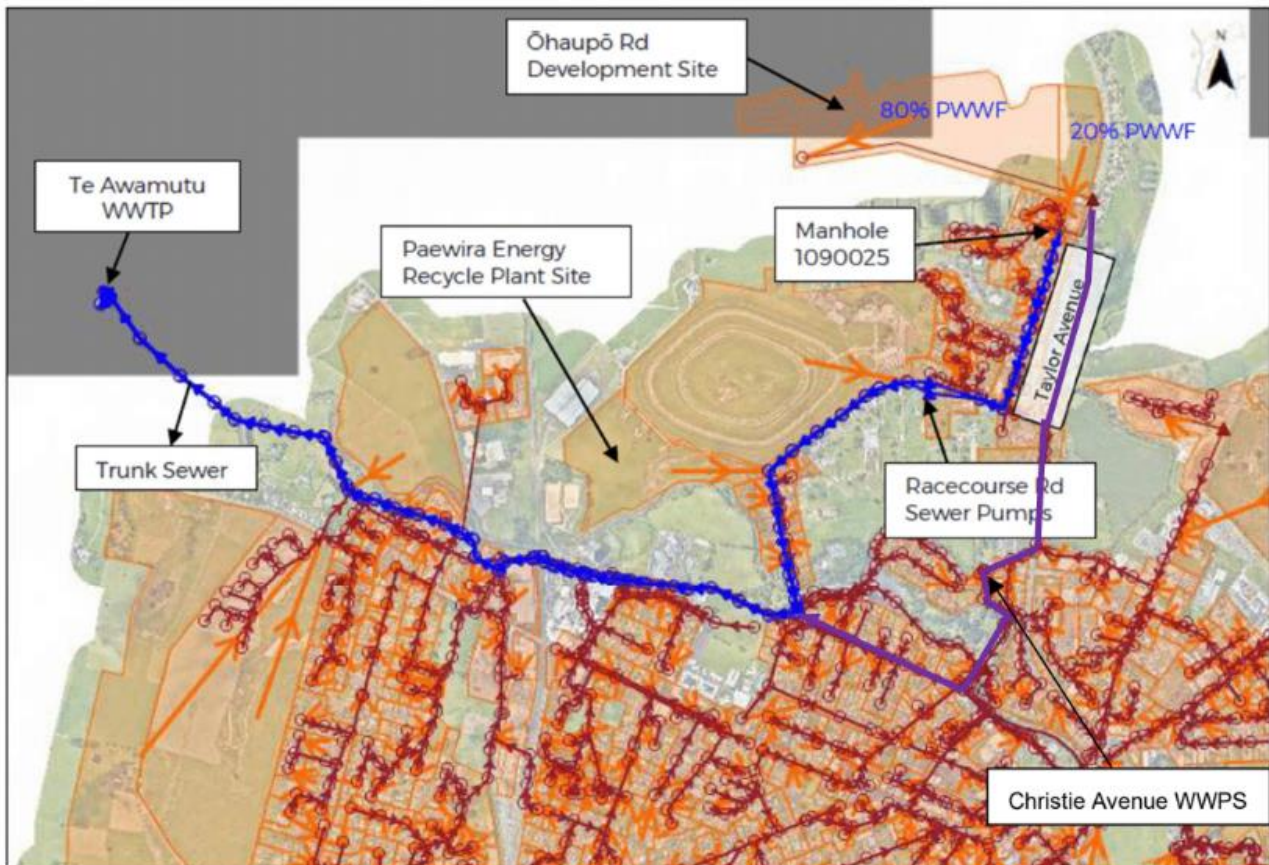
Catchment location plan (sourced from Wastewater Servicing Assessment)
